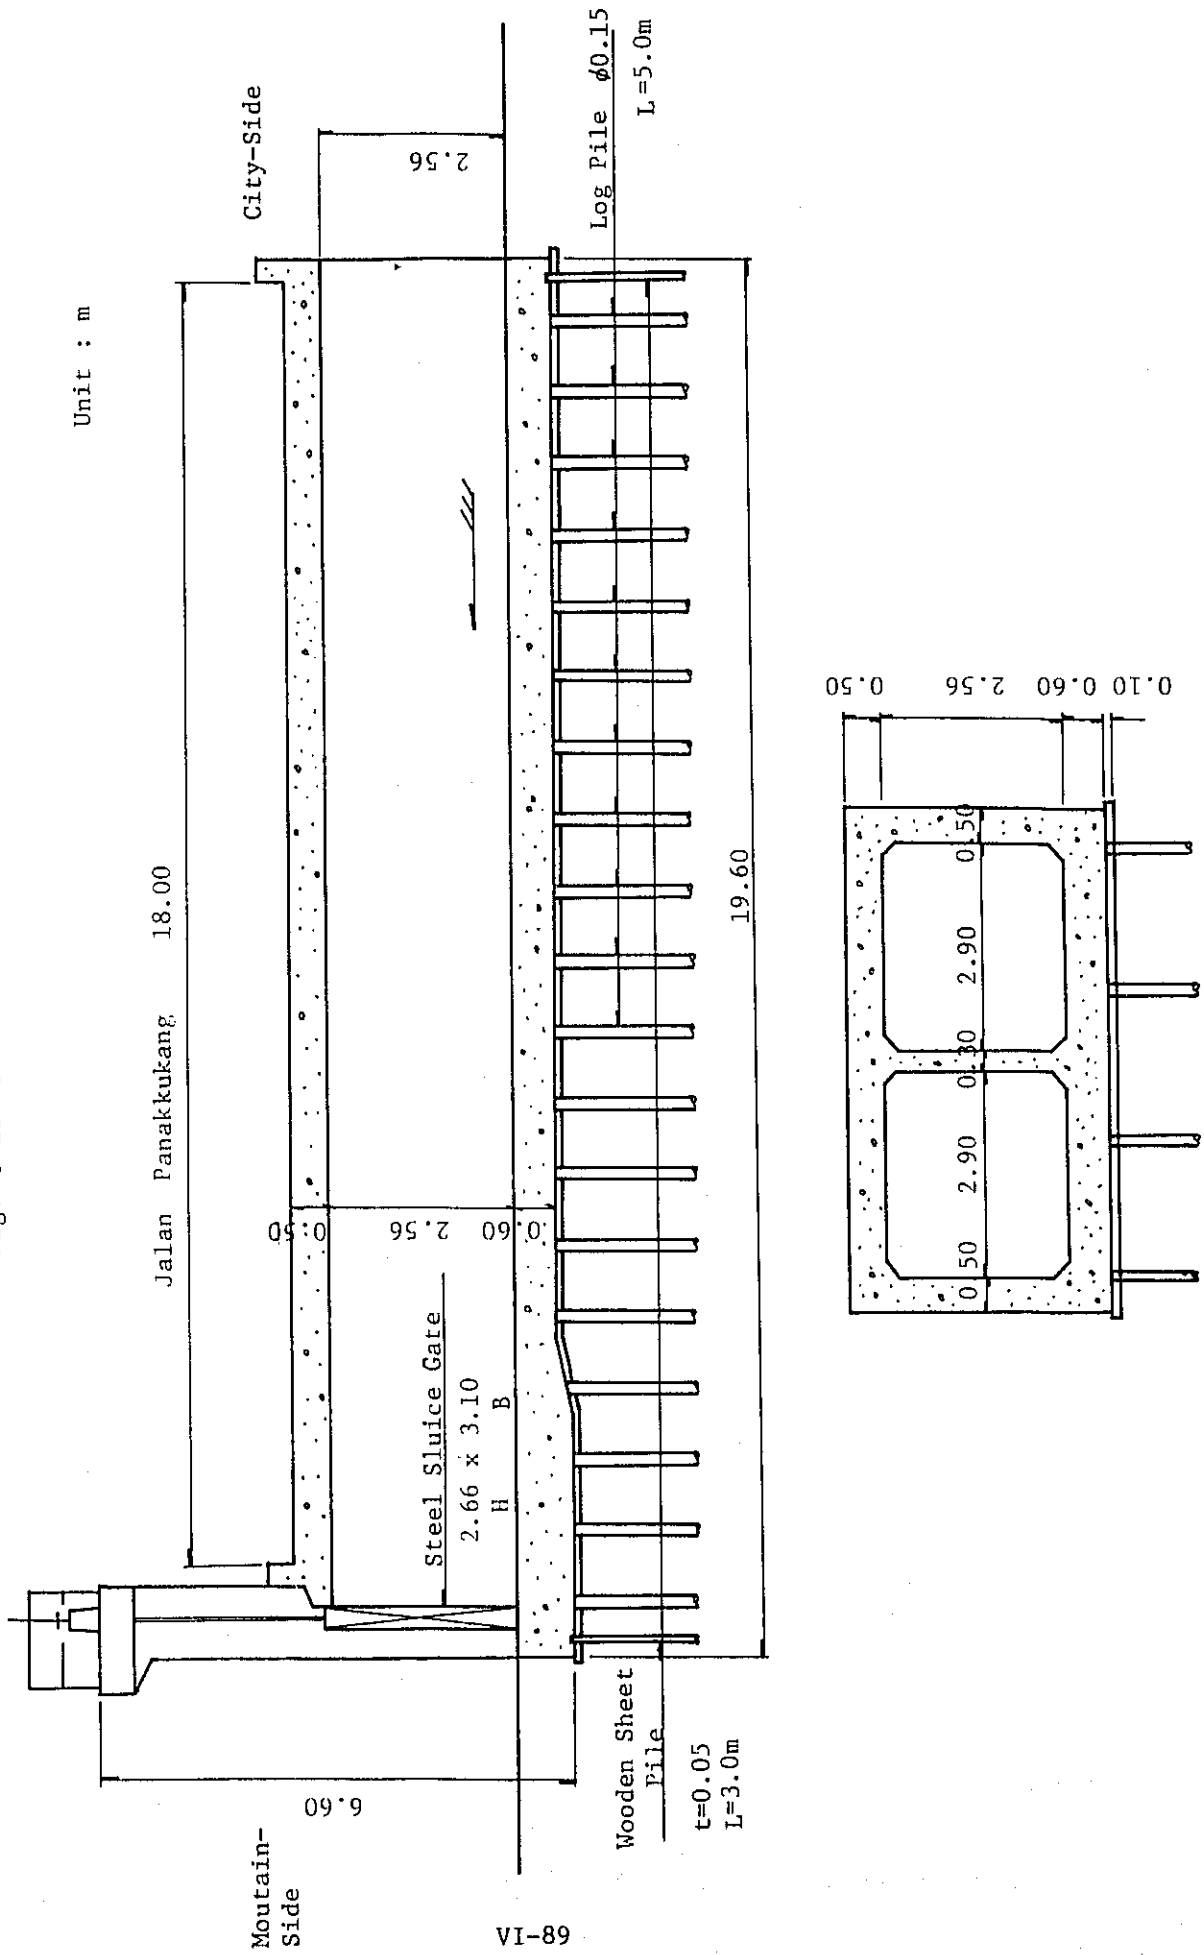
STANDARD DESIGN OF PROPOSED BRIDGE
